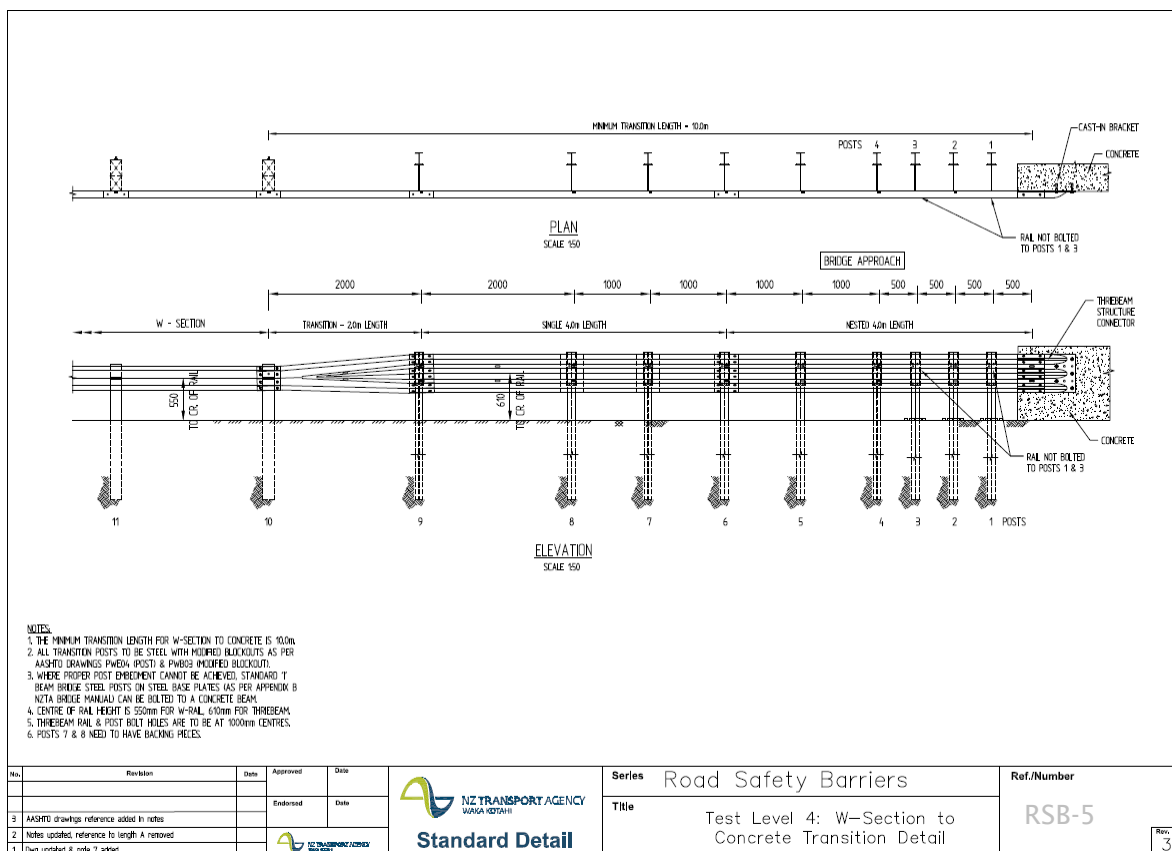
NZTA Accepted Detail TL-4 W-Section to Concrete Transition
